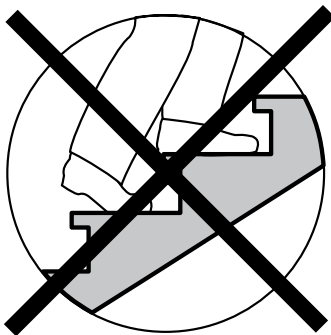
above from CSA B651 – Stair detail – Abrupt undersides (See Clause 5.4.2.)
